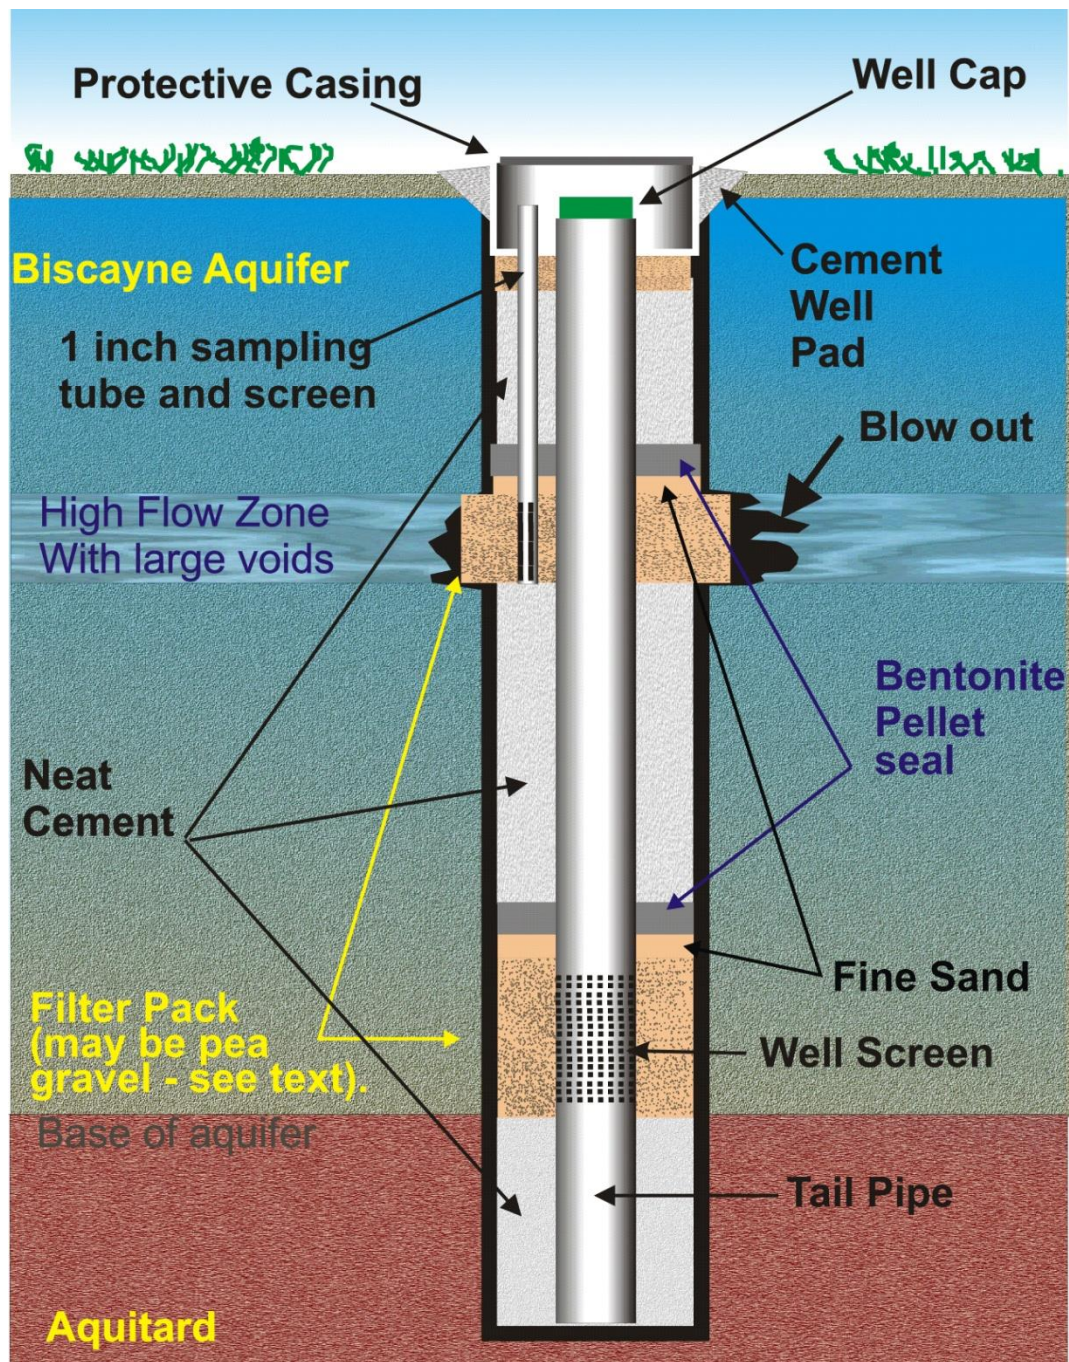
Schematic showing cross section of completed monitoring well showing use of sand instead of grout in large cavities and possible addition of a smaller sampling well. Neat cement may also be replaced by bentonite and sand as determined by the on-site geologist.
